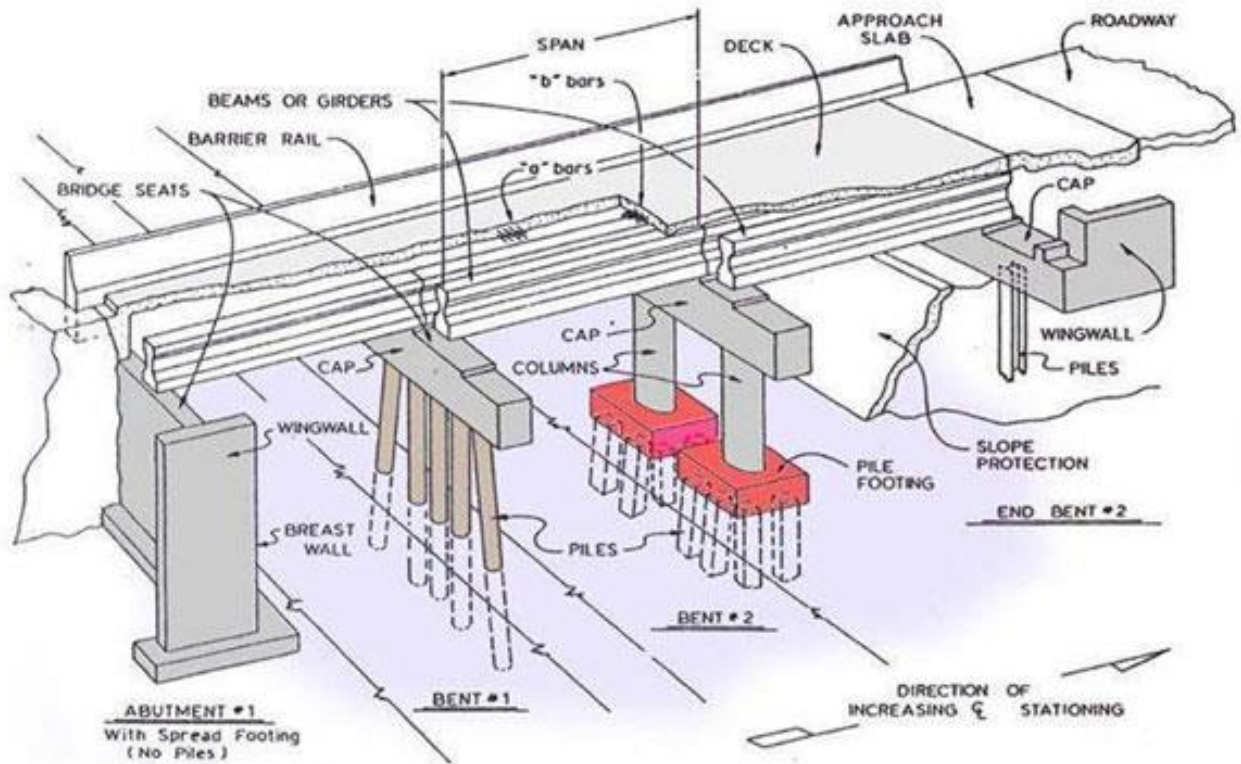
Bridge terminology [7] from Sketchup3DConstruction.com
